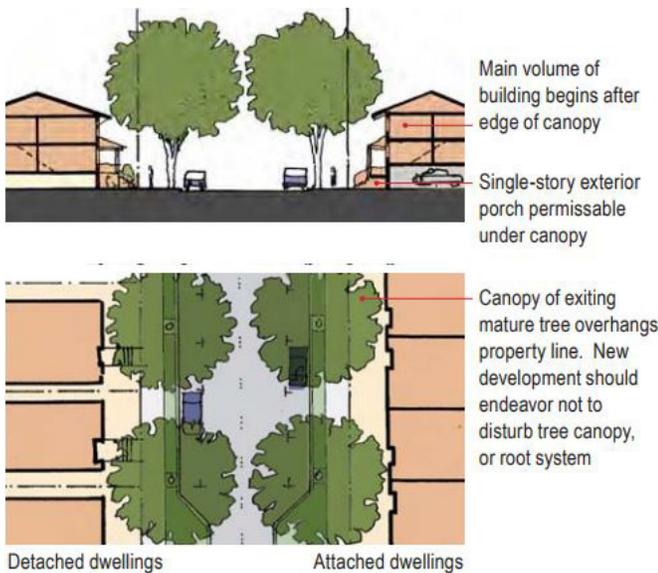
Prototypical street section and plan showing the relationship of street trees to property lines, parking and building volume.
